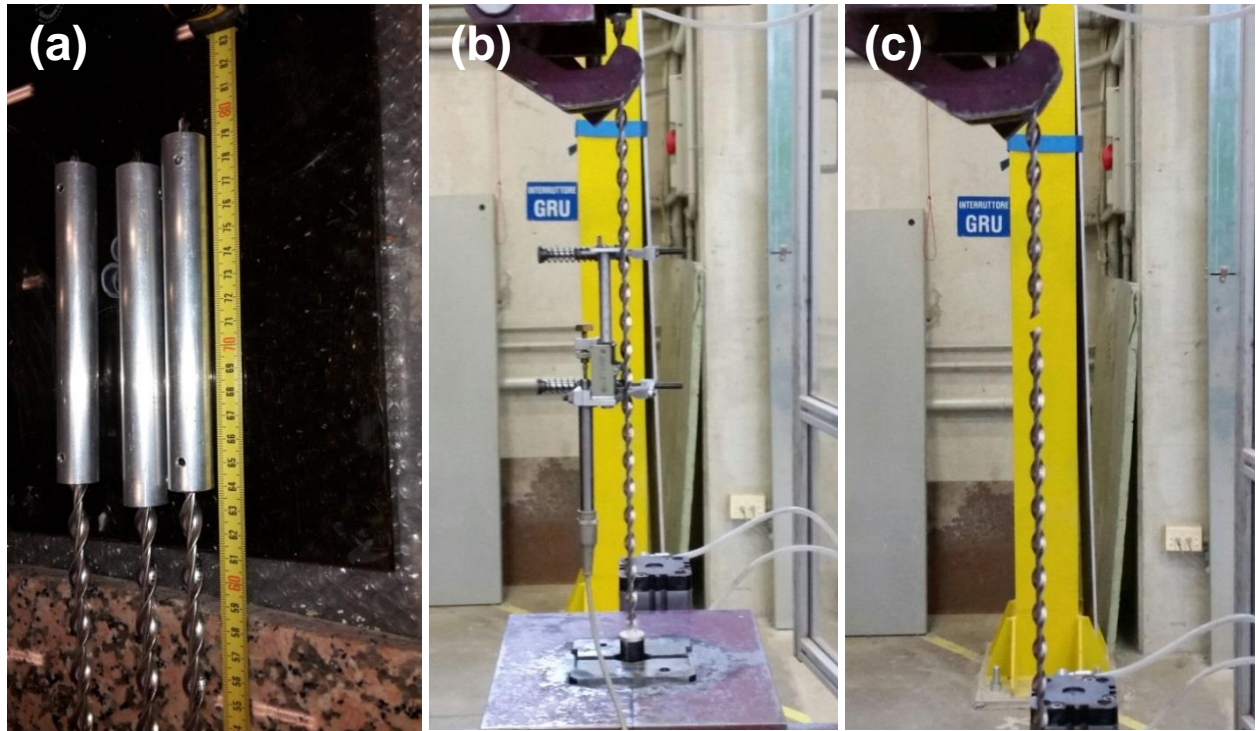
Tensile testing of the steel connectors: a) detail of the aluminum pipes employed as anchorage system; b) a steel connector during the test with the clip gauge placed in the central position; c) a steel connector after failure.
